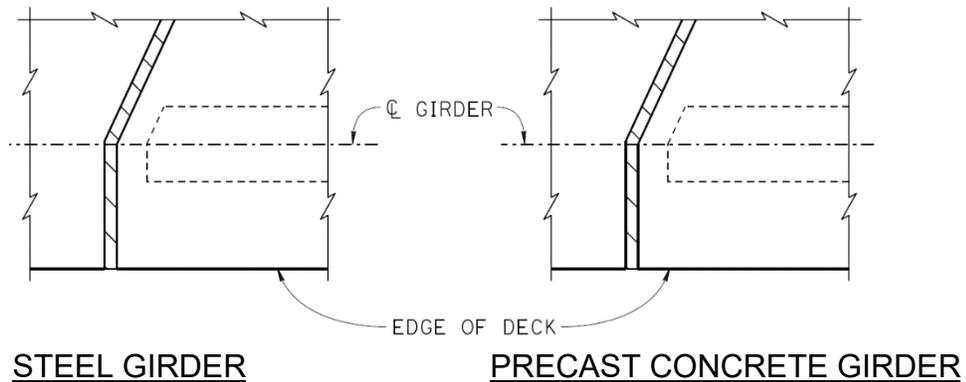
Deck Joints at Girders (Over 20° Skew)
